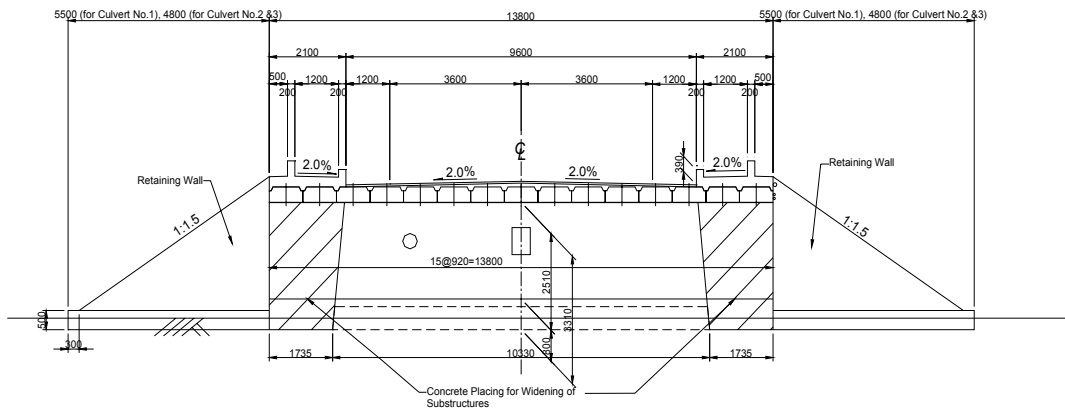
Typical Cross Section of Widened Culverts on Malakal Causeway
